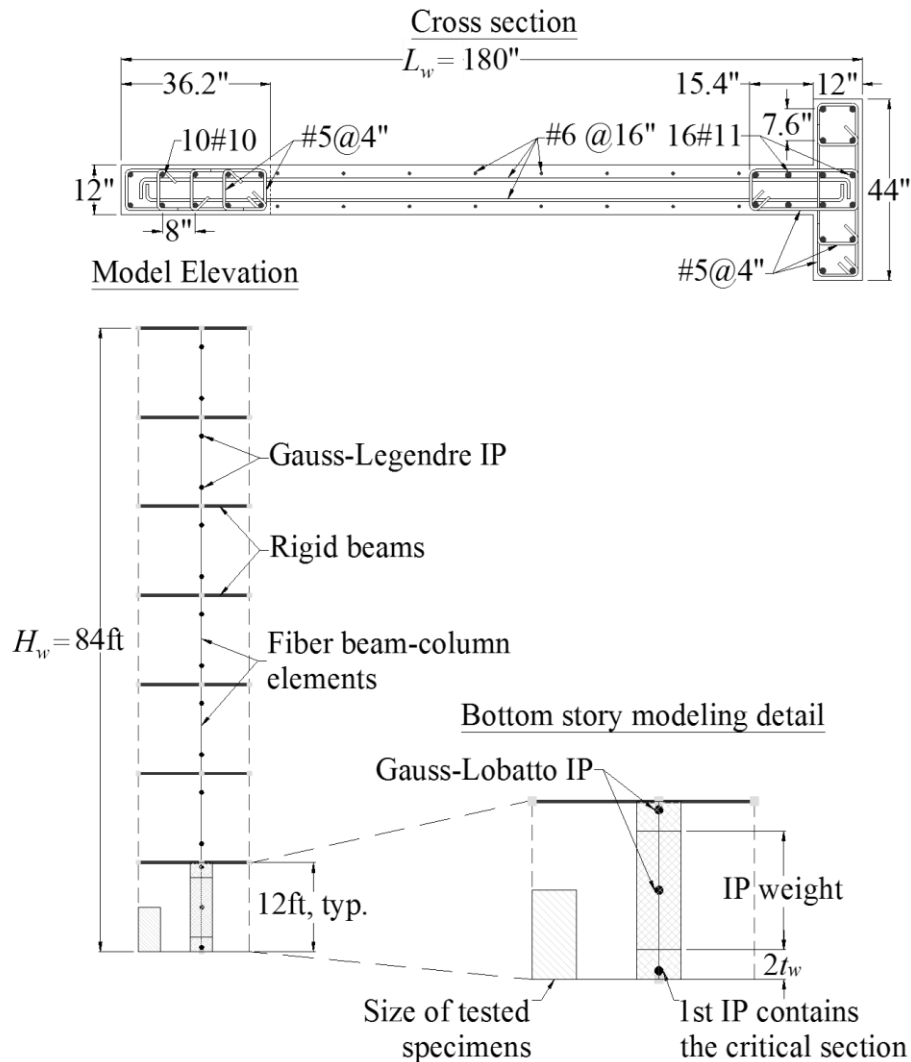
Geometry, reinforcement and model of the T-wall studied.
